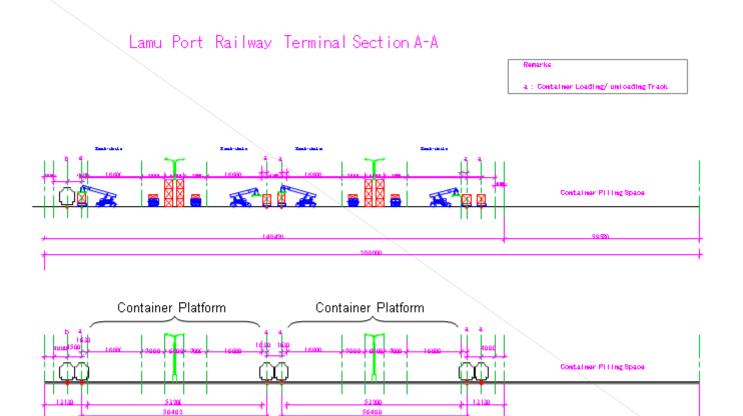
Lamu RFT - Cross Section A-A – Container Loading / Unloading Facilities (JPC study)
